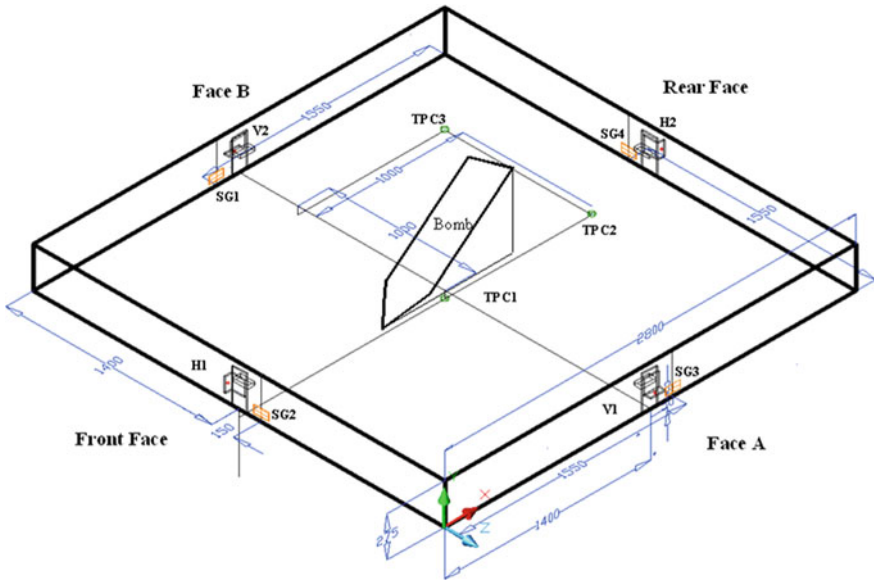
Instrumentation layout for the Slab I (3D View)
